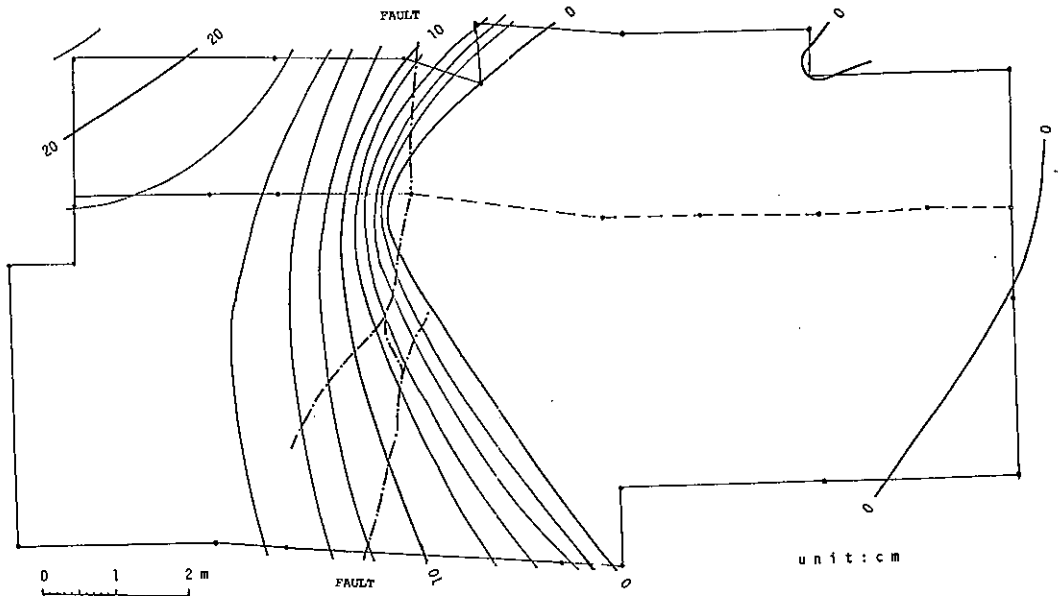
Plan of a remain of house foundation destroyed by the Irozaki fault at loc. 5.
